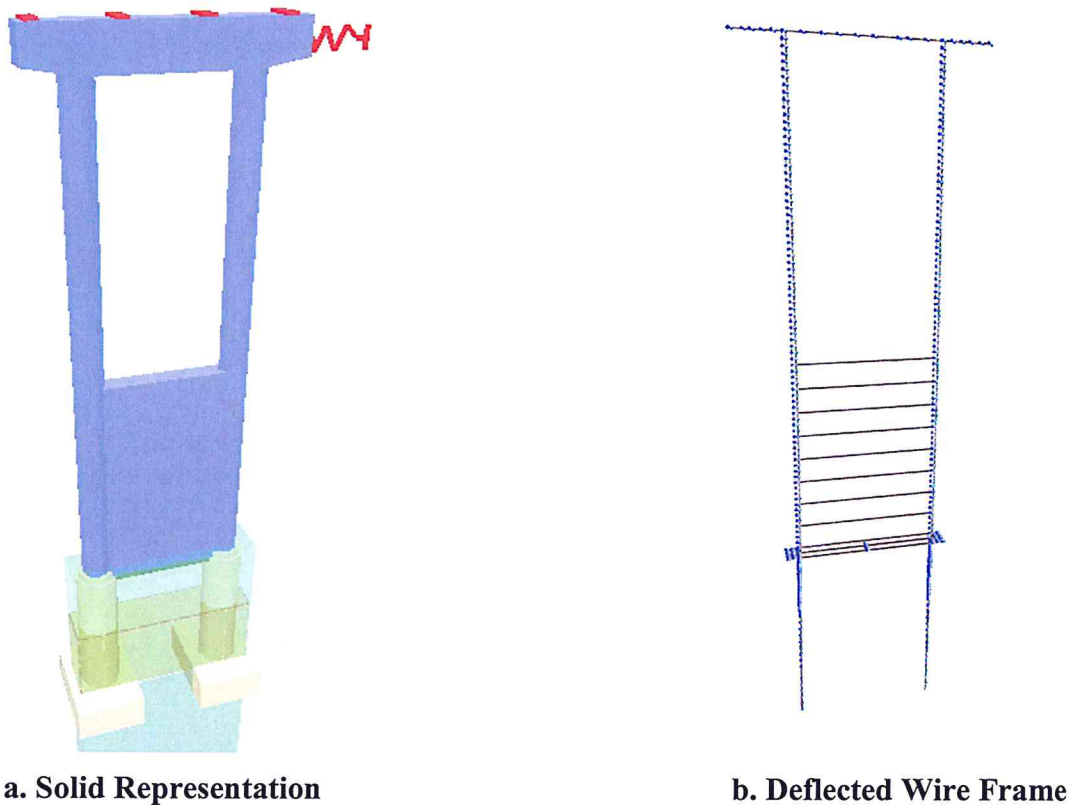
FB-Pier Finite Element Model for Rebuilt Side Piers
